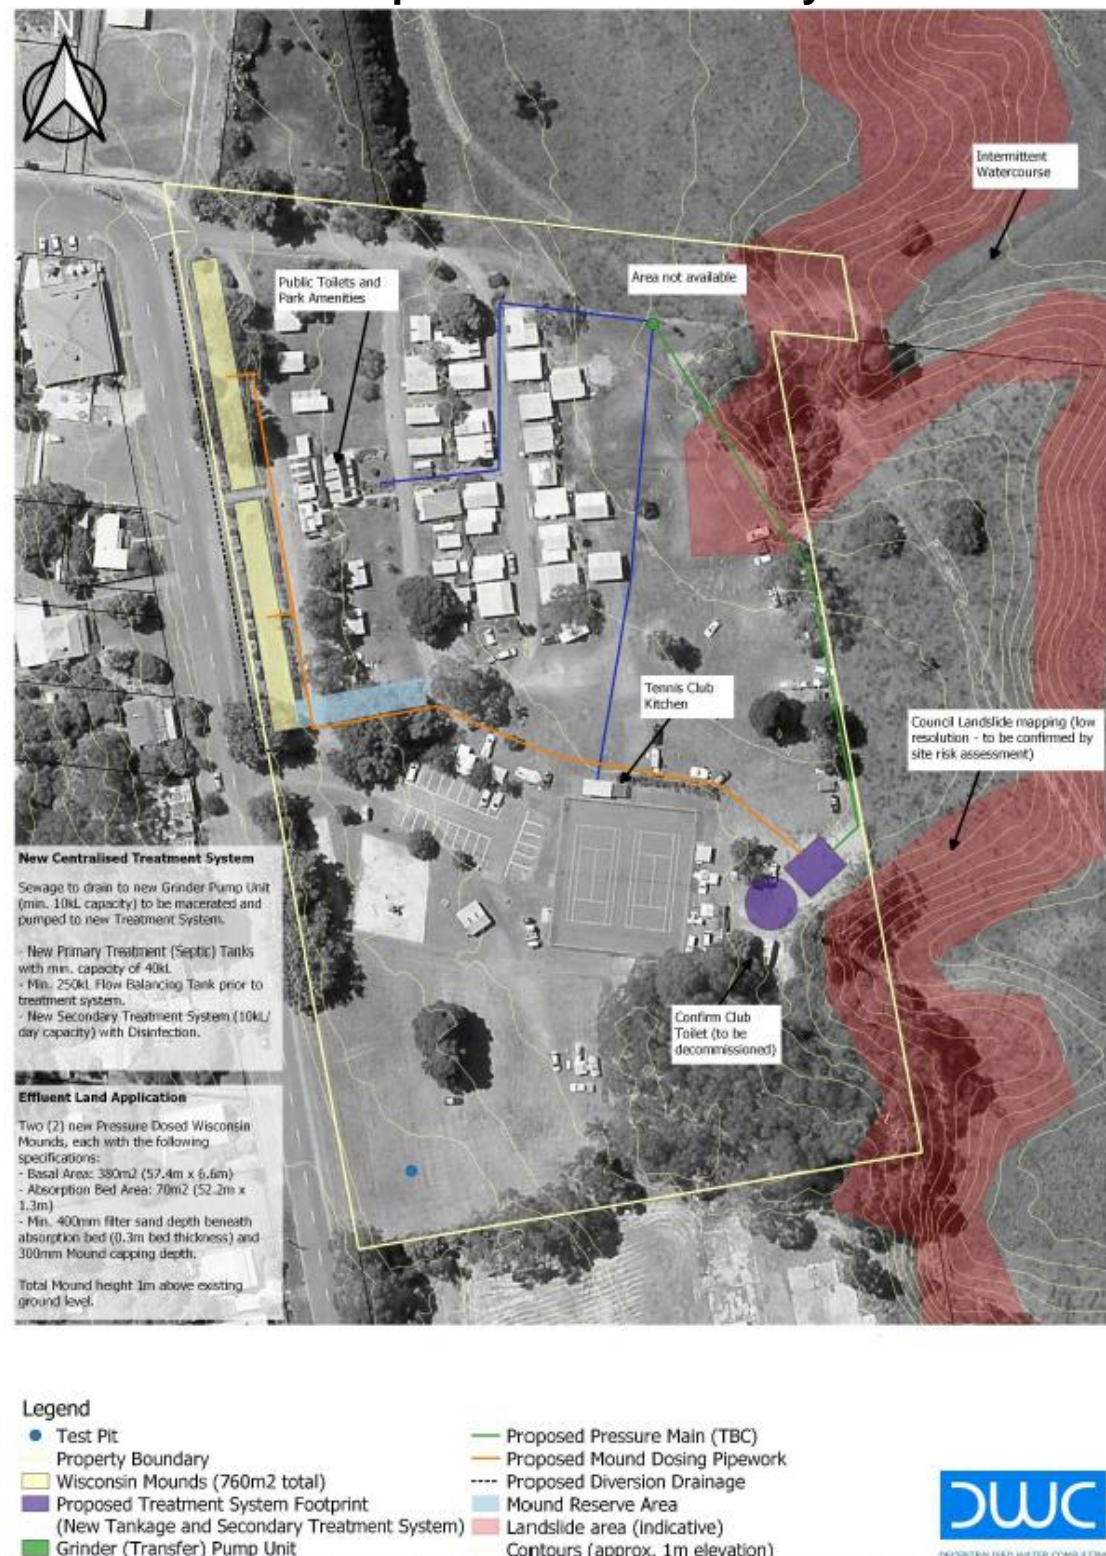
Forrest Caravan Park – Proposed On-Site Wastewater System.
